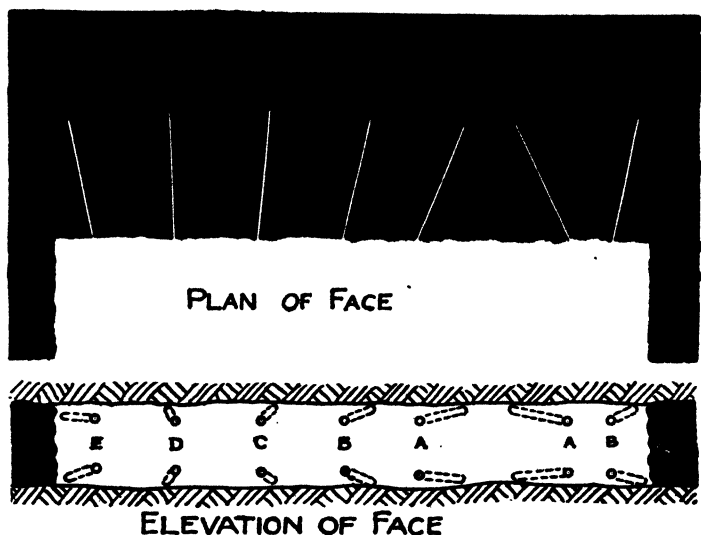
ARRANGEMENT OF DRILL HOLES WHEN USING JACKHAMMER AND MECHANICAL LOADING.
